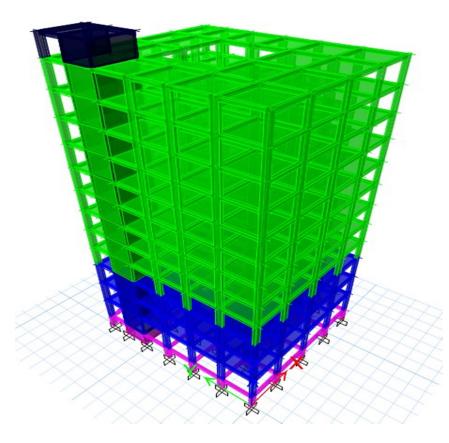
3D view of (G+12) storied commercial building for Plan 02
